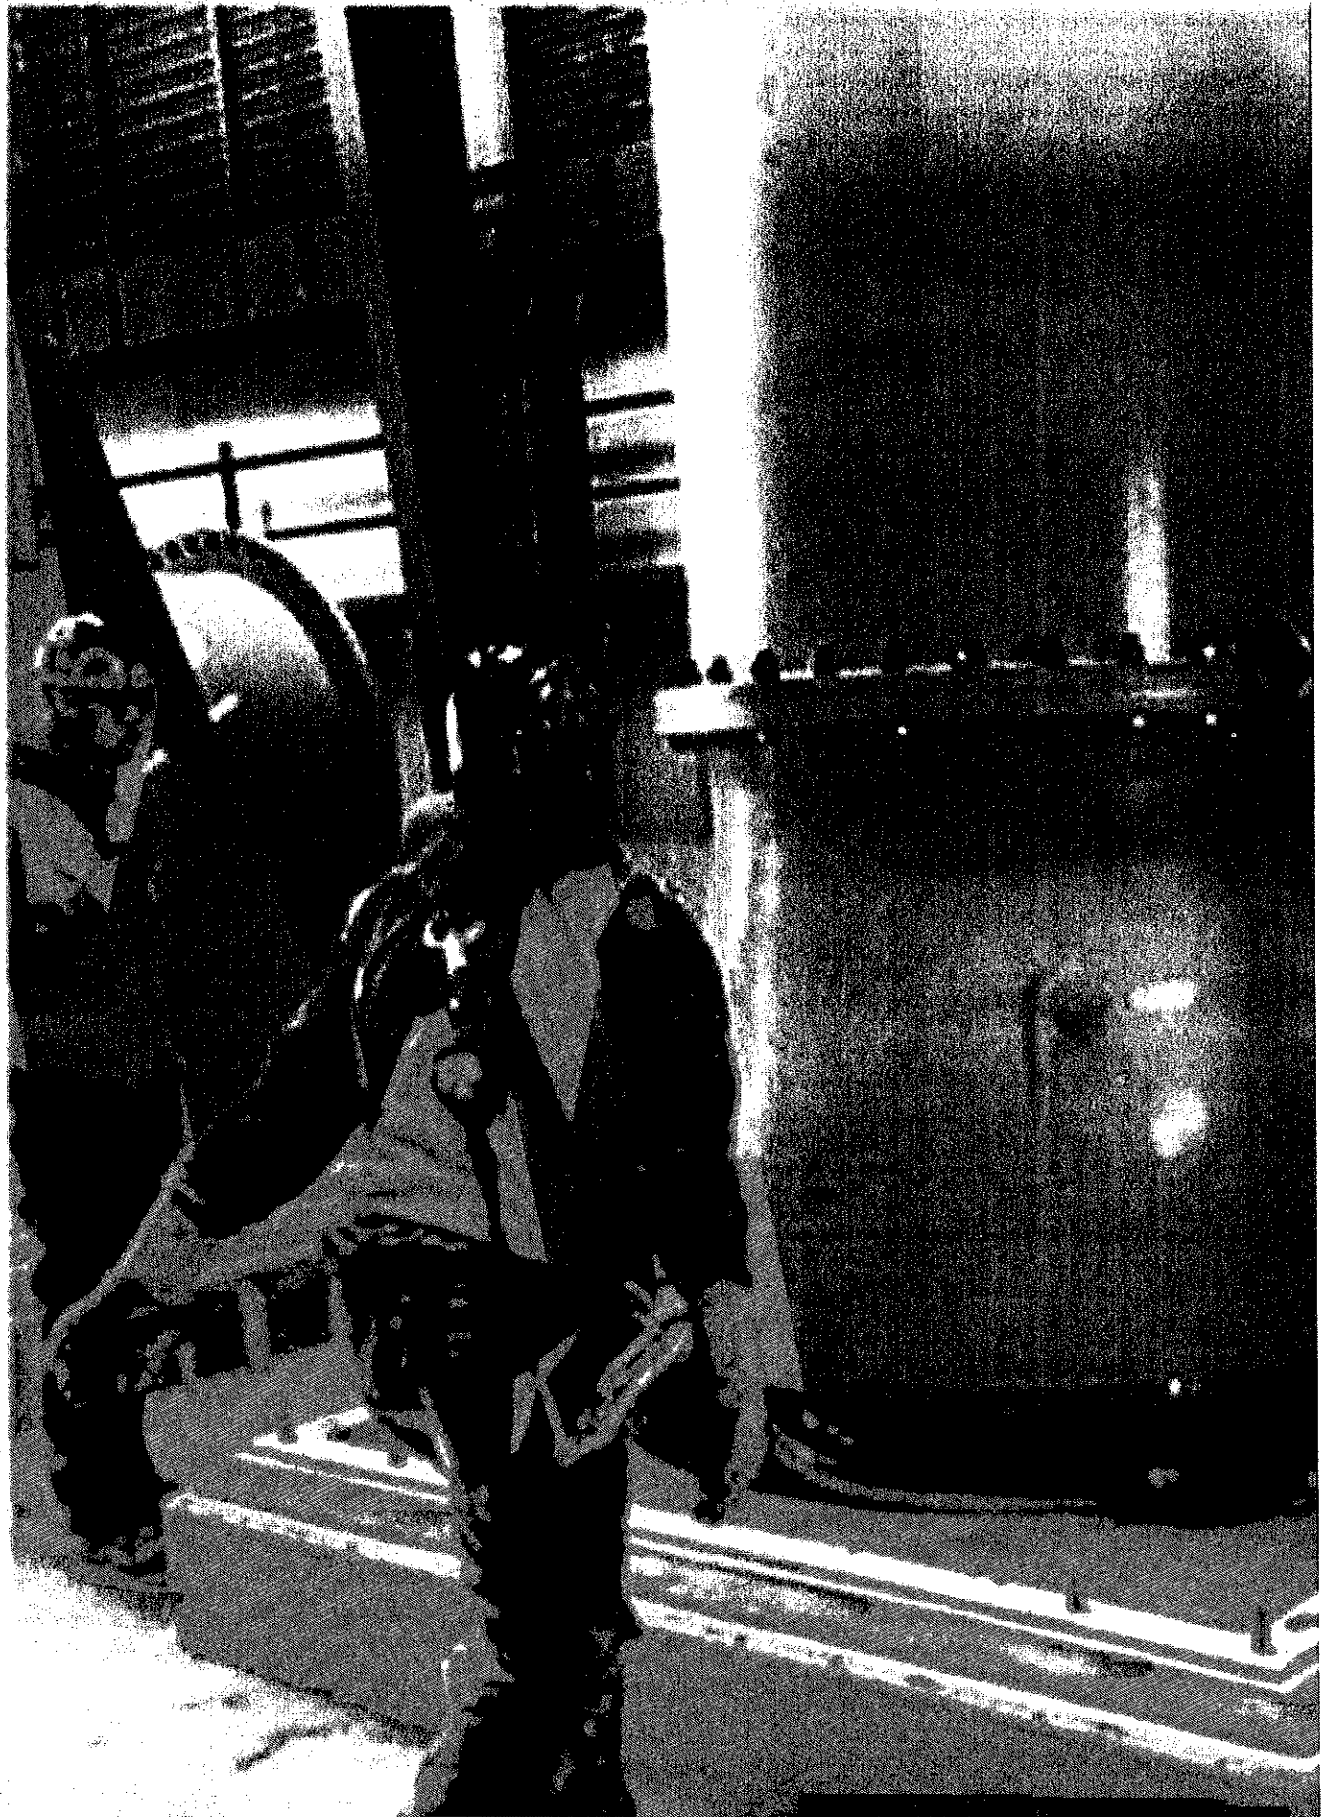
Lowering of the pump through the floor opening for pump bay no. 4.
